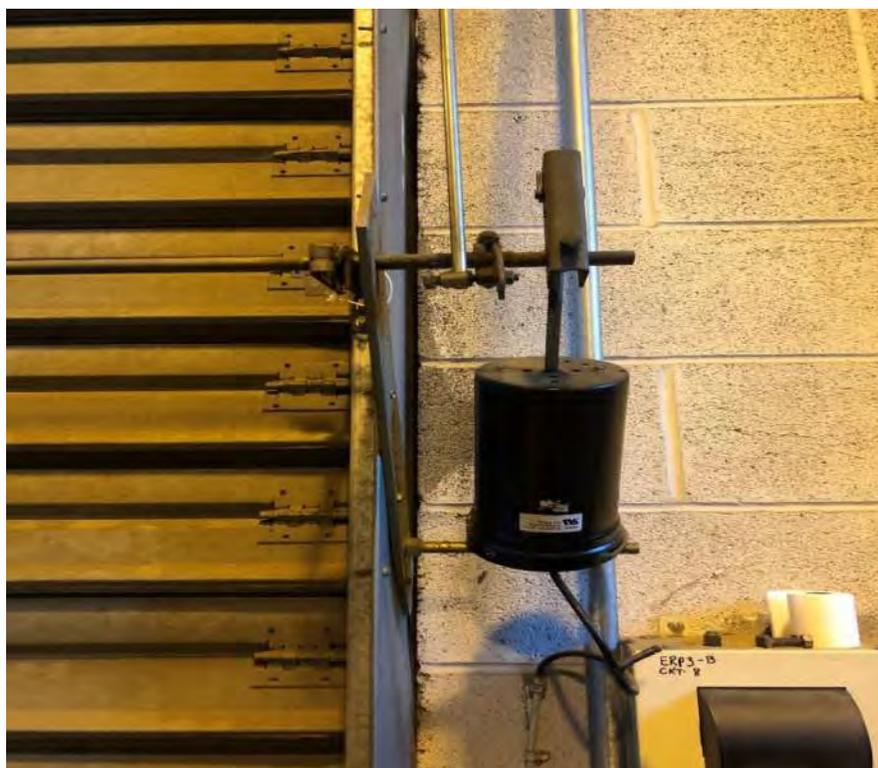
View of non-suspect louver actuator in basement room B-5. Photo taken December 23, 2020.
